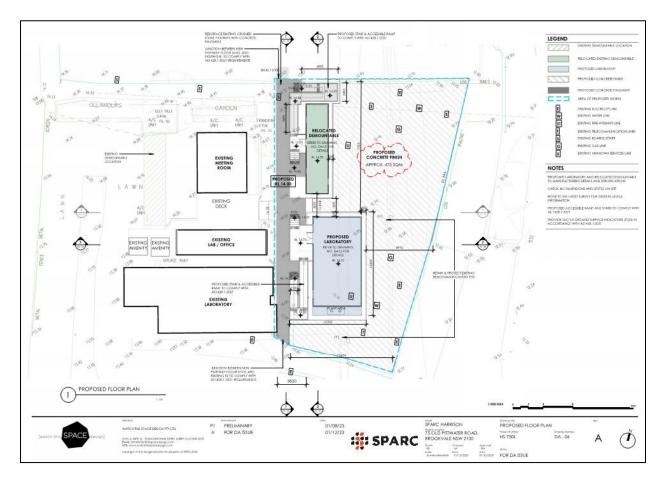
Floor Plan (Source: Watch This Space Design Pty Ltd, December 2023)
